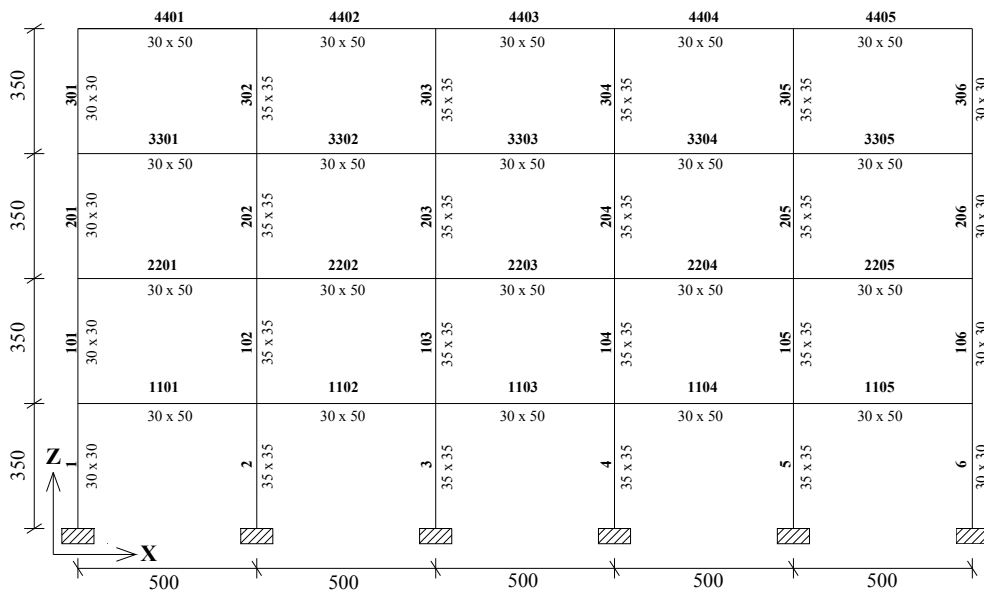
Configuration of <ZX> elevation of "structure 1"
